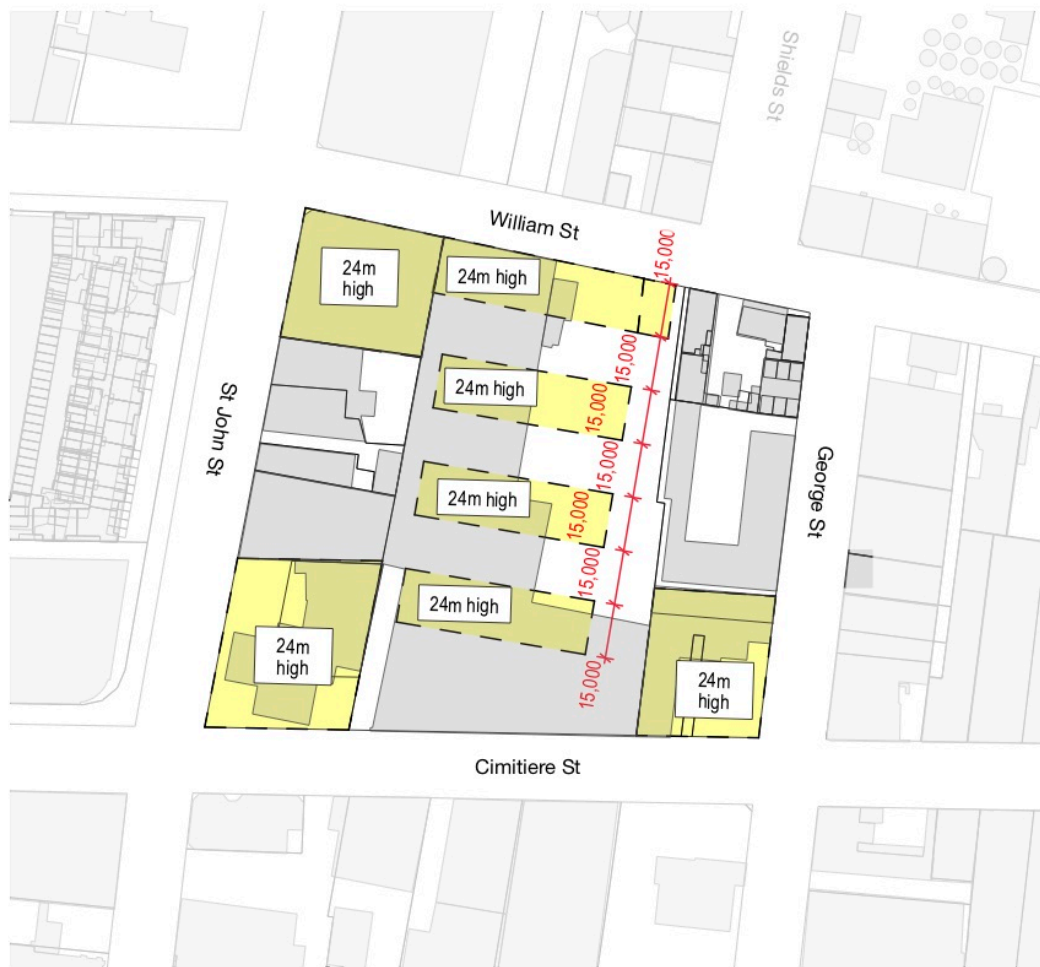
SITE B1 - Option 2 - Site Plan, St John, William, George and Cimitiere Street Block.
